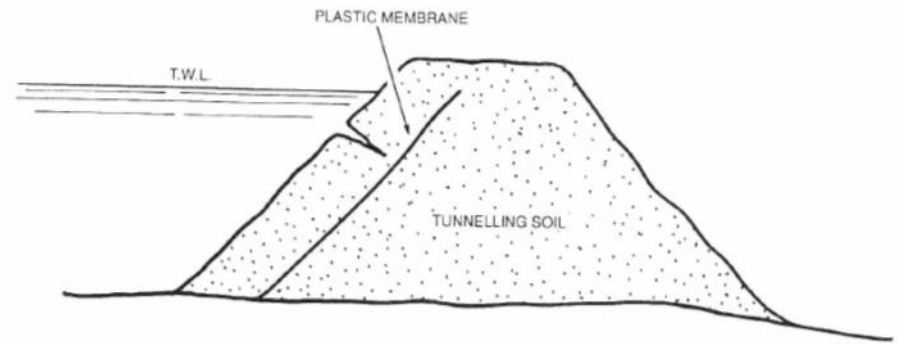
A plastic membrane located in a dam embankment to prevent tunnel failure.
